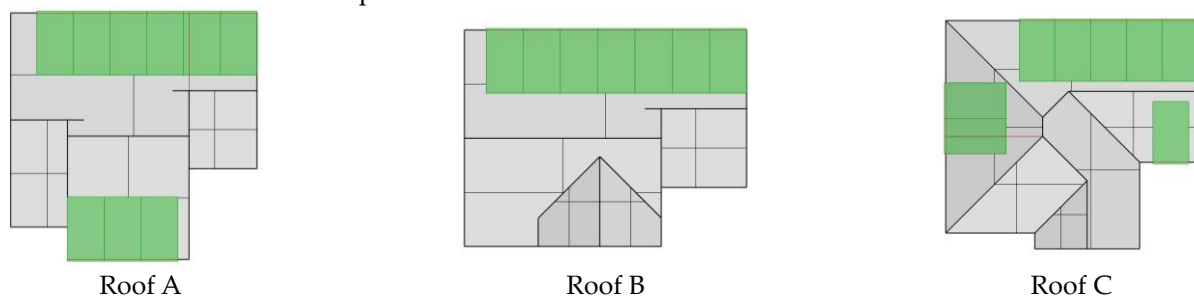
PV mounting capacity on each roof. There are 9 PV panels on roof A, 7 on roof B, and 8 on roof C.
